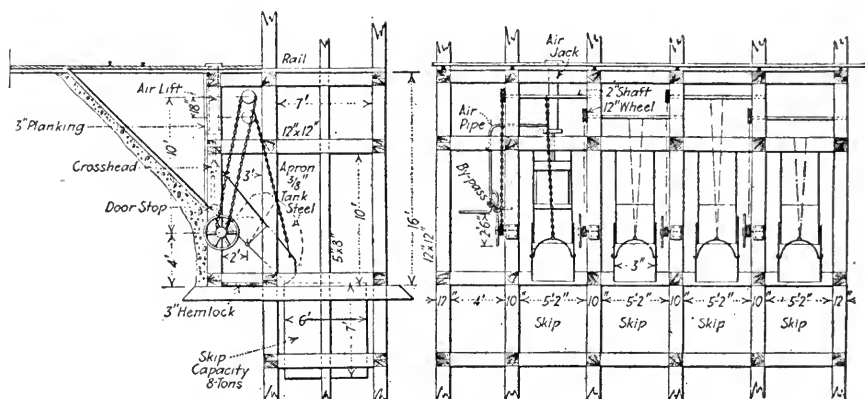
BINS AND LOADING CHUTES, HANCOCK NO. 2 SHAFT STATIONS.
